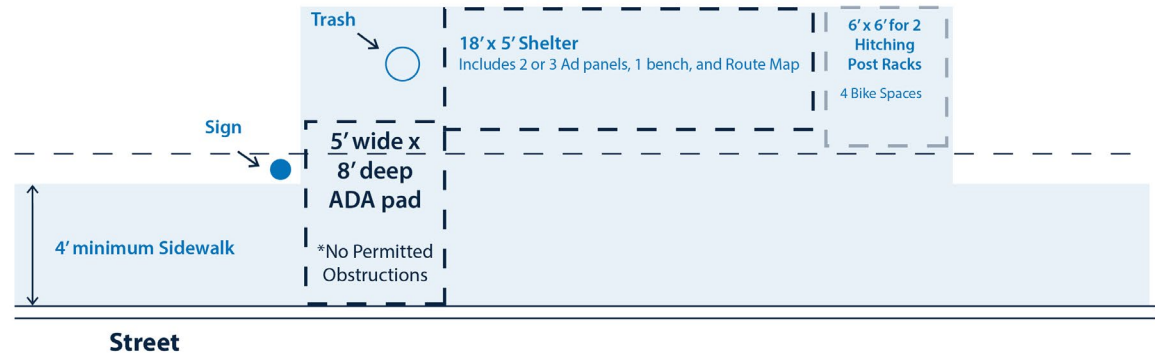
Type III Constrained (Attached Sidewalk) – Amenity Detail
